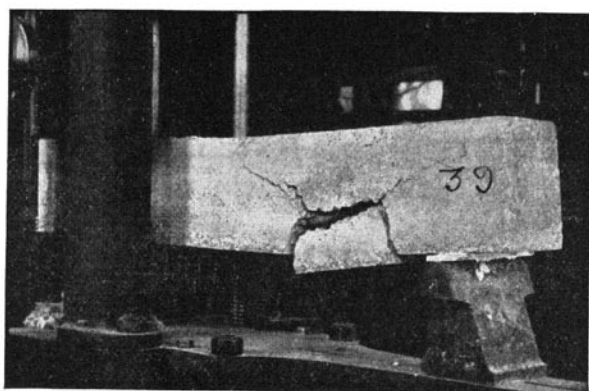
VIEWS SHOWING BEAMS AFTER FAILURE.
